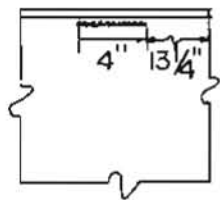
CRACK DETAILS OF GIRDER 22050 D
